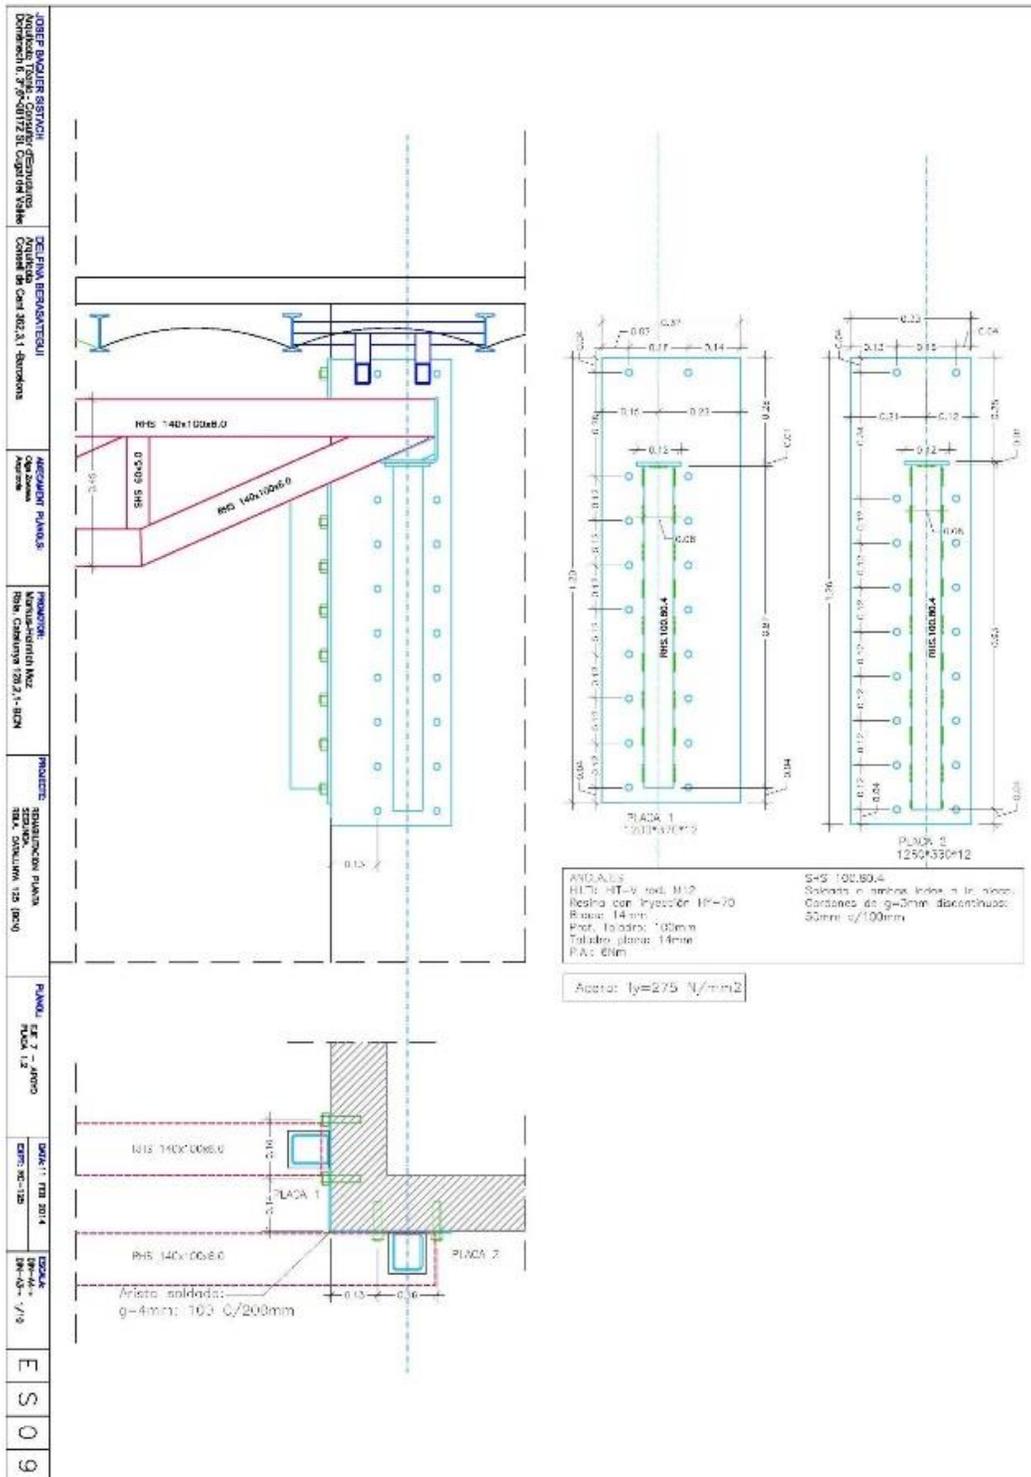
Technical details showing how to anchor the structural elements to the masonry wall. ©Josep Baquer
